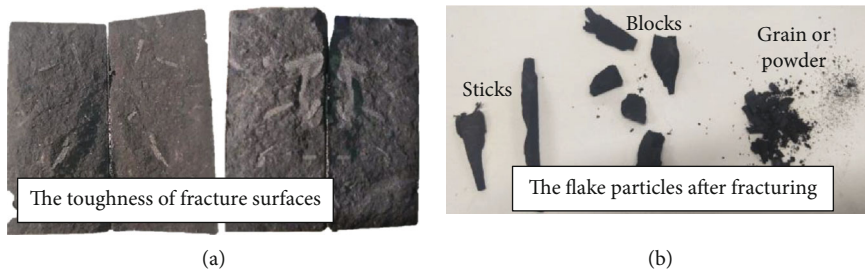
Fracture surfaces and flaking particles.
